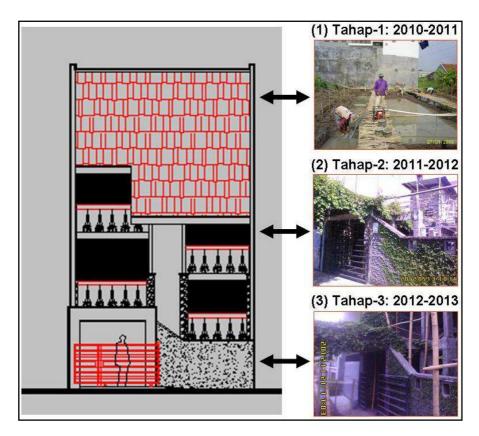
The Building Construction (2010-2013) and Landscaping Construction (2013-2015): Creating Element of Water, Wind and Flora at First, Second and Third Floor
